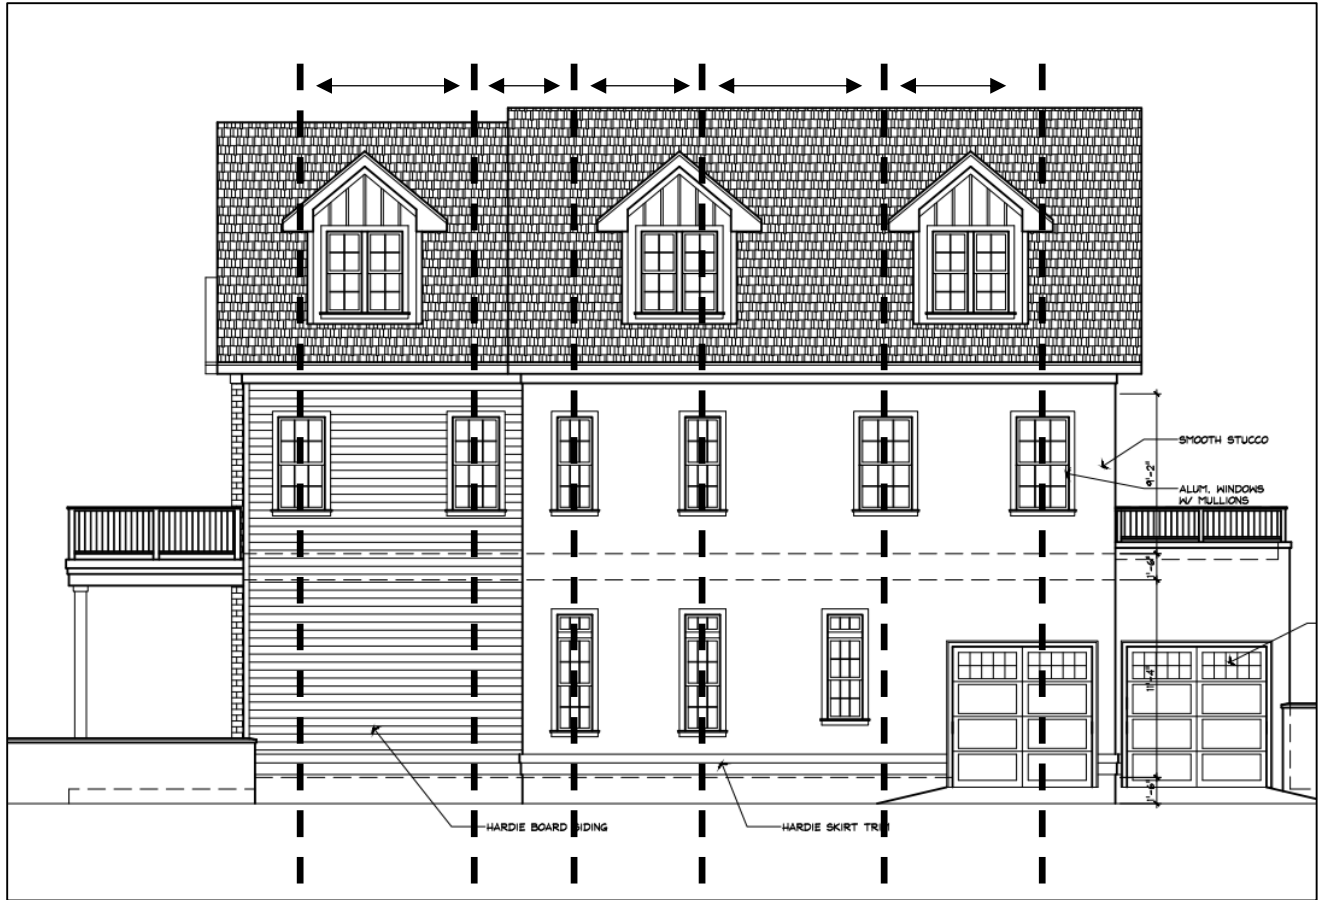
The proposed residence features an atypical and arrhythmic arrangement of window openings, particularly at its south, street-side elevation
